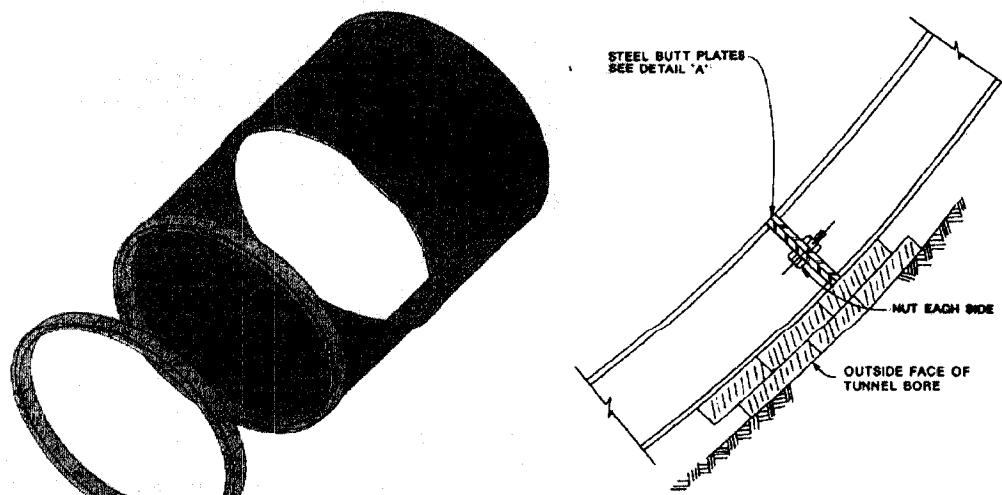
Typical steel ribs and timber lagging (American commercial incorporated) and rib joint (City of Edmonton)
